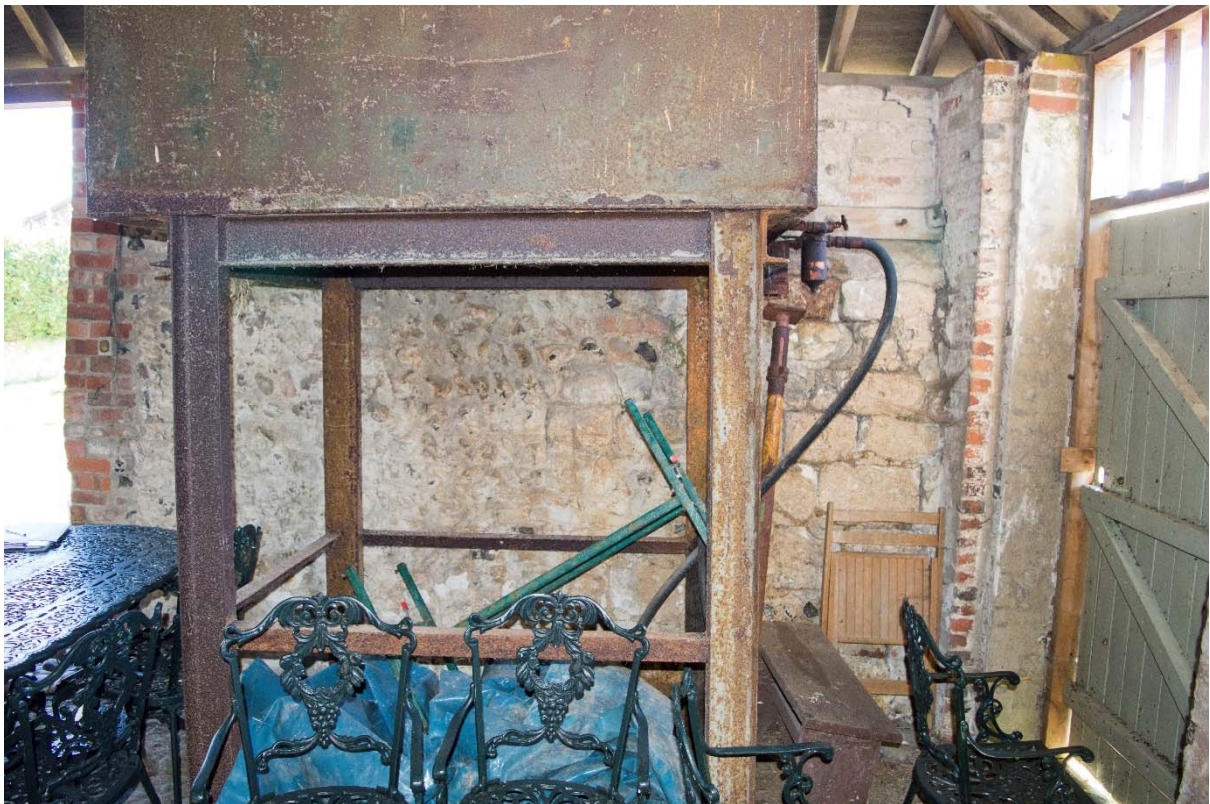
Walling material of the earlier structure retained within the east wall of the present building (30)
